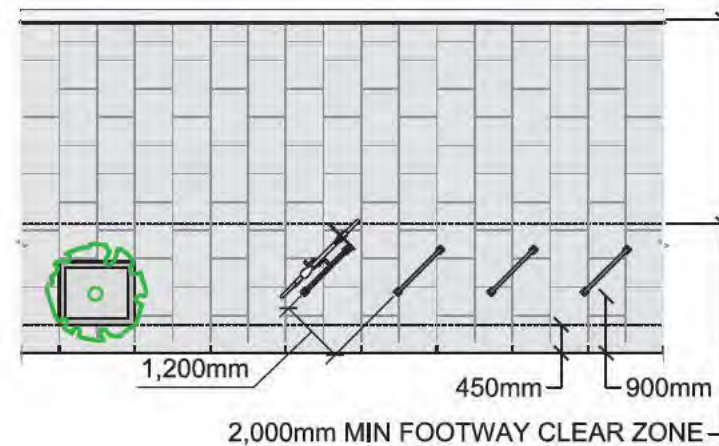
On-footway cycle parking arrangements are dictated by the amount of footway space
